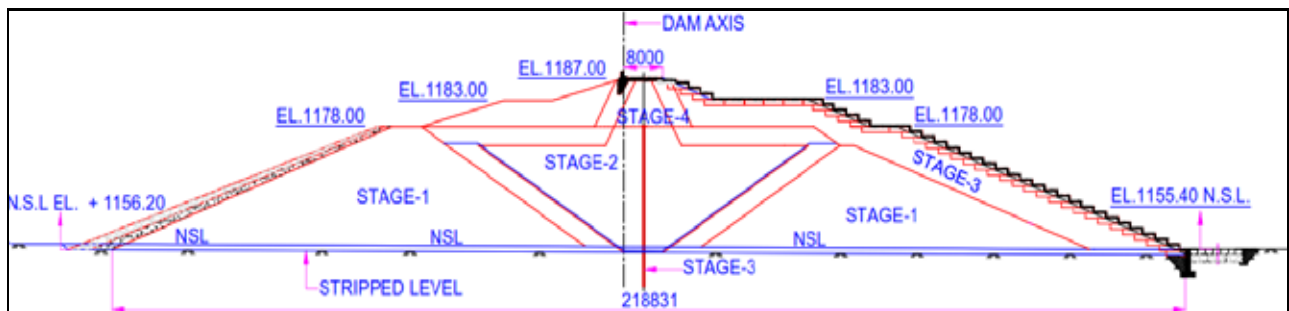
Maximum section of Upstream Cofferdam (rockfill) at Tender Stage
